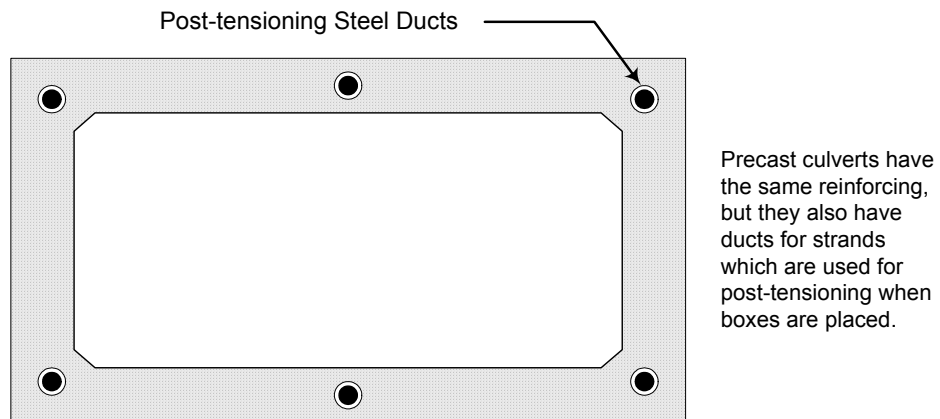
Precast Box Sections with Post-tensioning Steel
